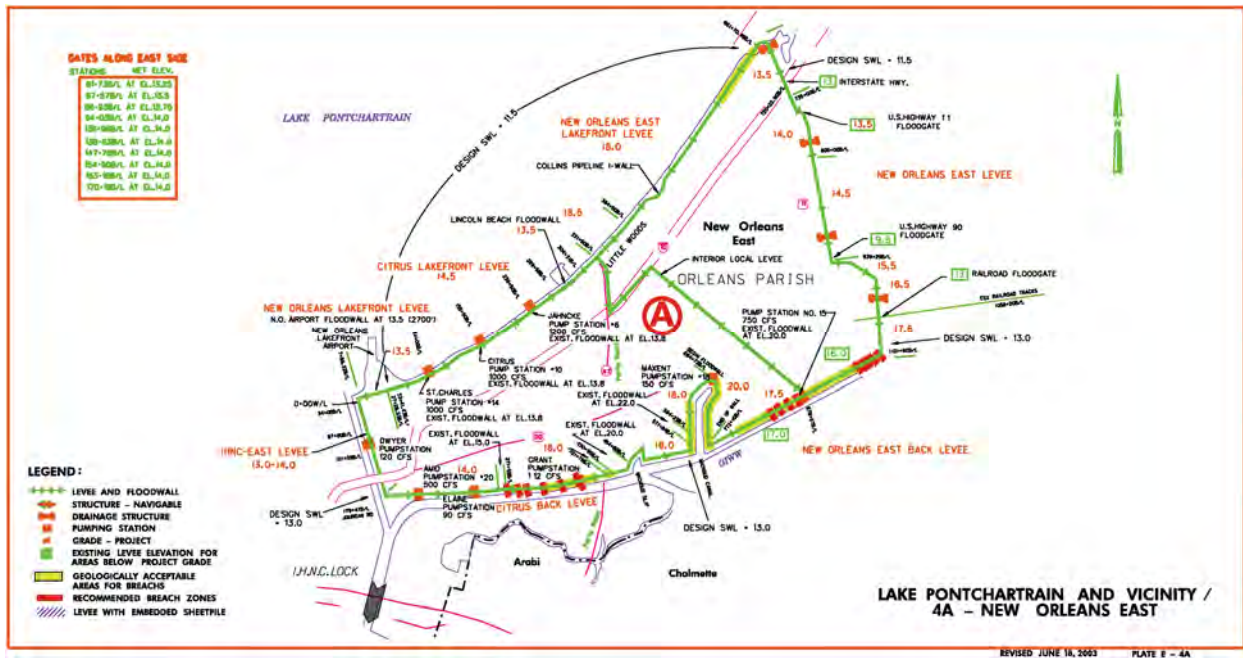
NOE Basin general components and top of levee/floodwall as-built elevations (feet) (source USACE, New Orleans District (Wayne Naquin))
